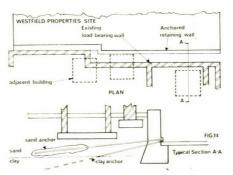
Use of sand and clay anchors at Westfield Properties site in Durban.
